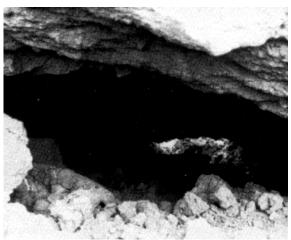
Photo of a piping damage (Vattenfall 1988)
